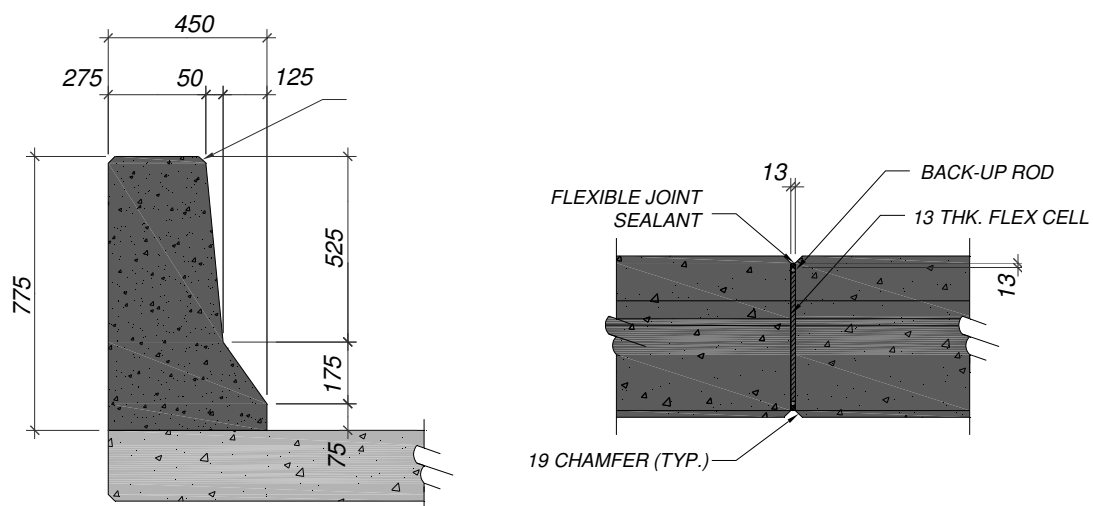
Barrier wall concrete details (Cross section “C” from Figure 3-4(a))
